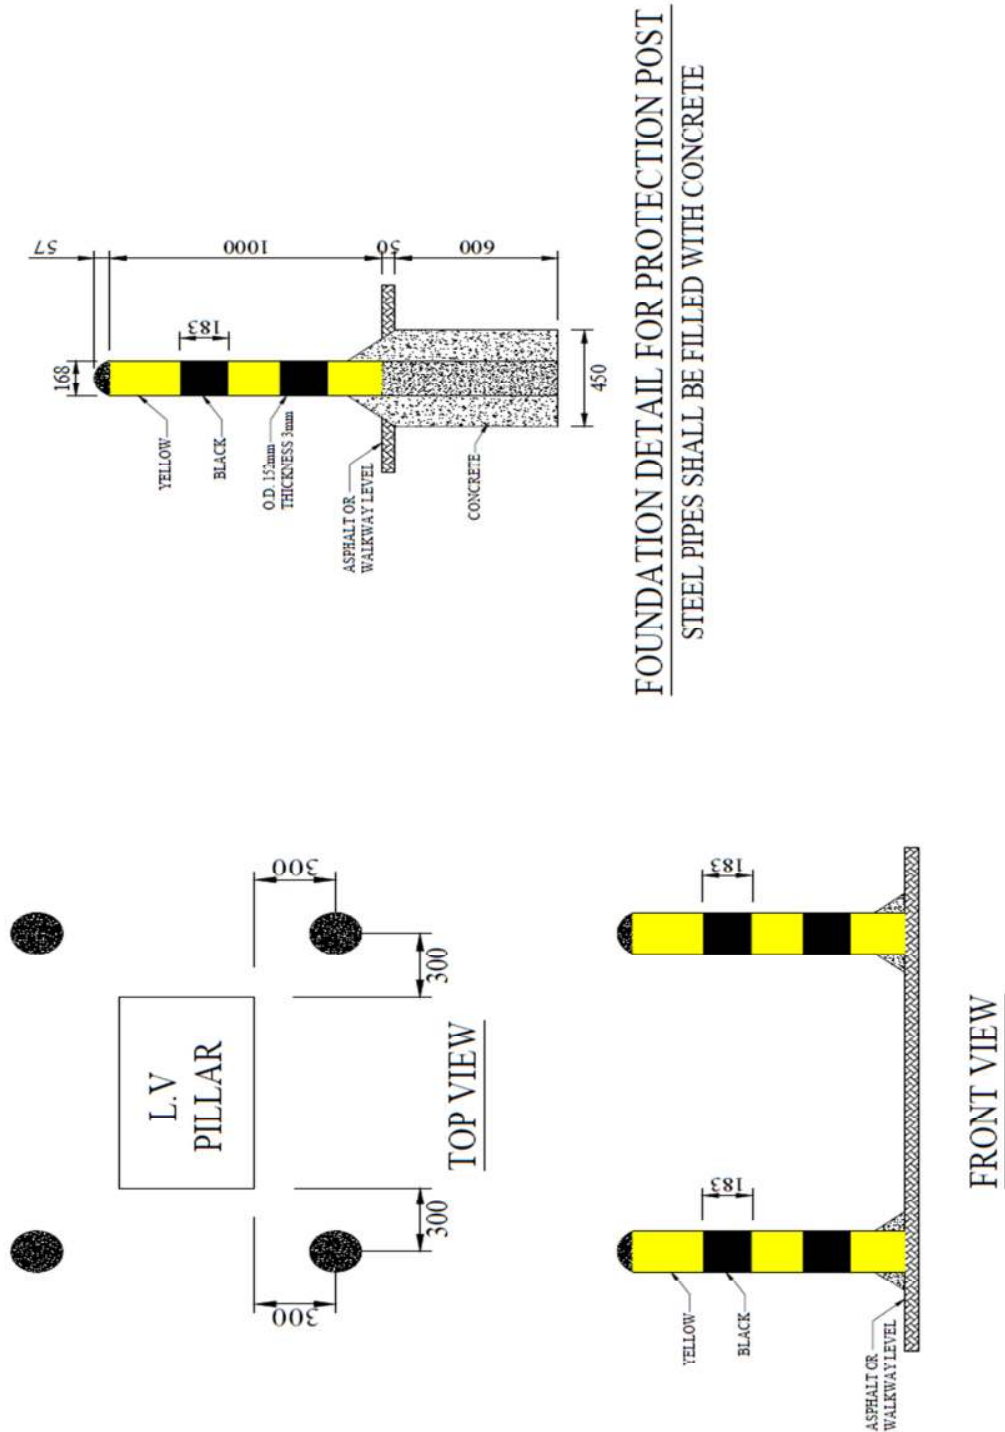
FIG: I - PROTECTIVE BARRIER FOR L.V PILLAR
